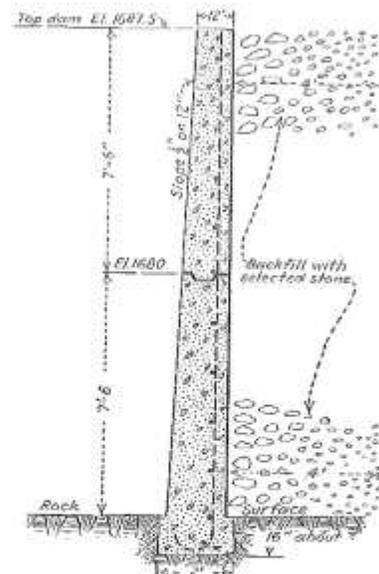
THE CUTOFF WALL was built in two sections, the first extending from rock to within $7\frac{1}{2}$ ft. of the top. The top is level with the spillway of the existing dam in Dry River.
